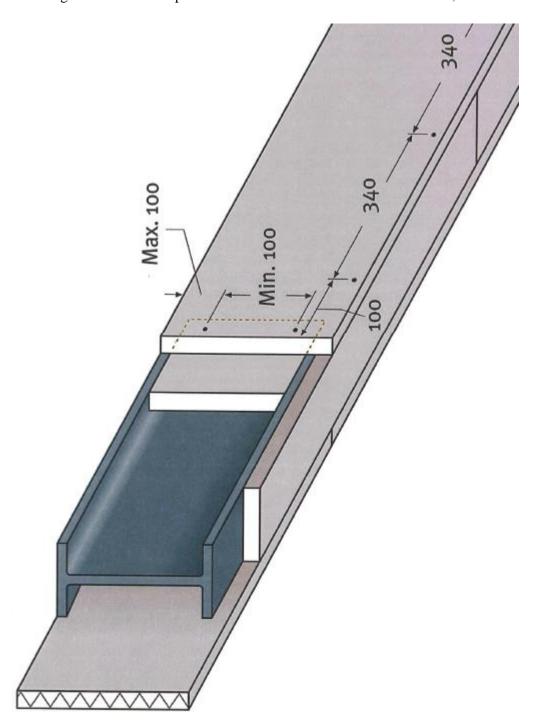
Position of screws in open profiled steel – three sided Screws 3.8×45 mm used for 25 mm fire protection Screws 5.0×90 mm used for 50 mm fire protection
